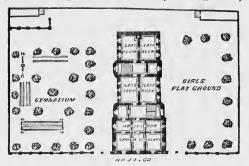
BLOCK PLAN OF DOUBLE SCHOOL-HOUSE, WITH GYMNASIUM,
